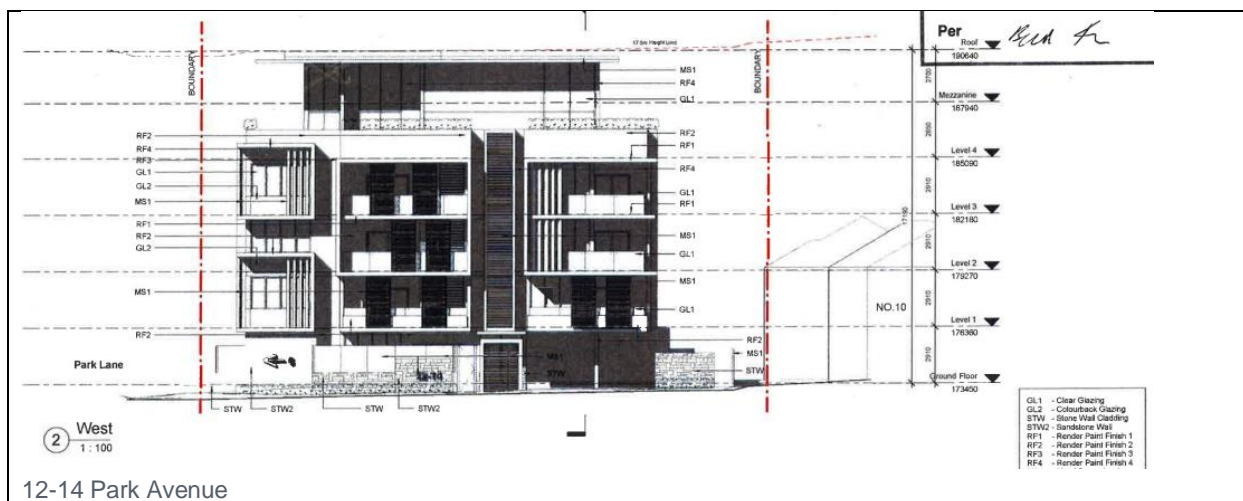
The three buildings to the south of the subject site with five storeys plus mezzanine designs
